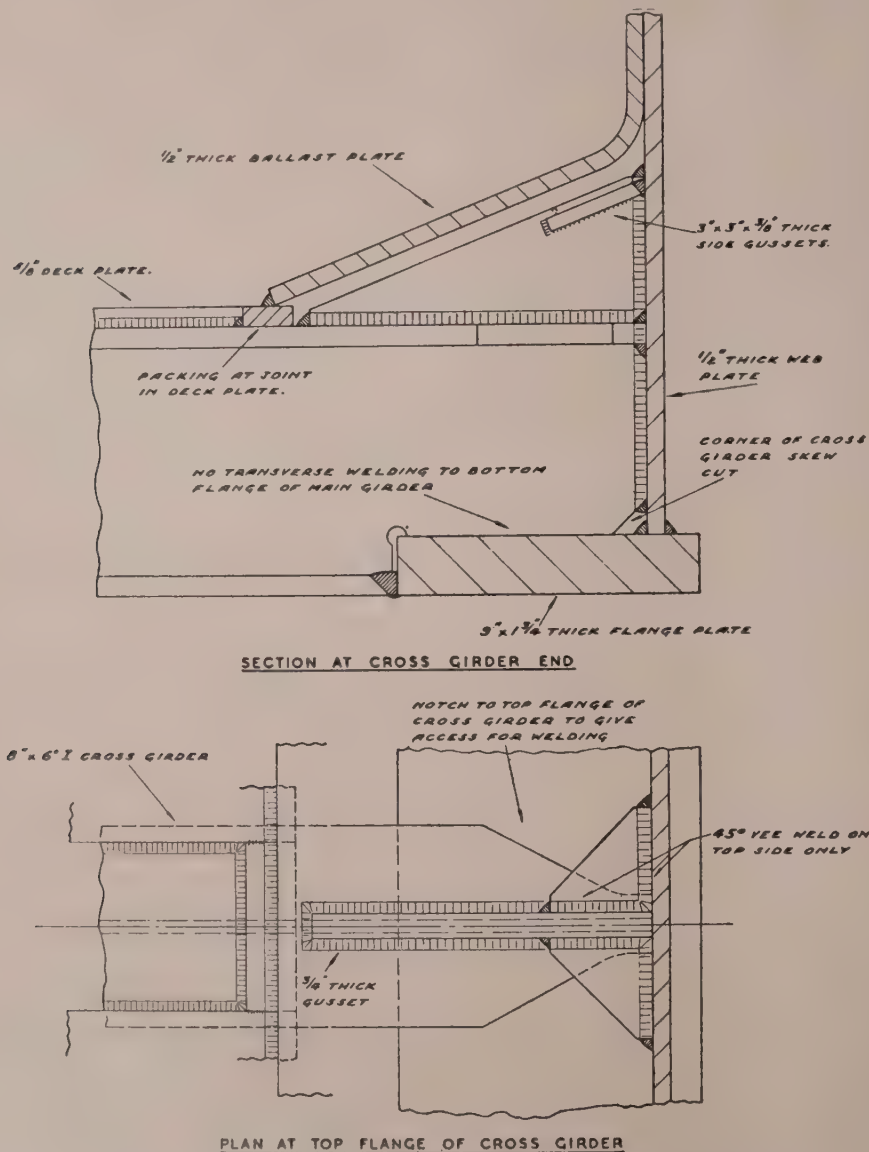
Stewarts Road Bridge. Detail at end of cross girders
